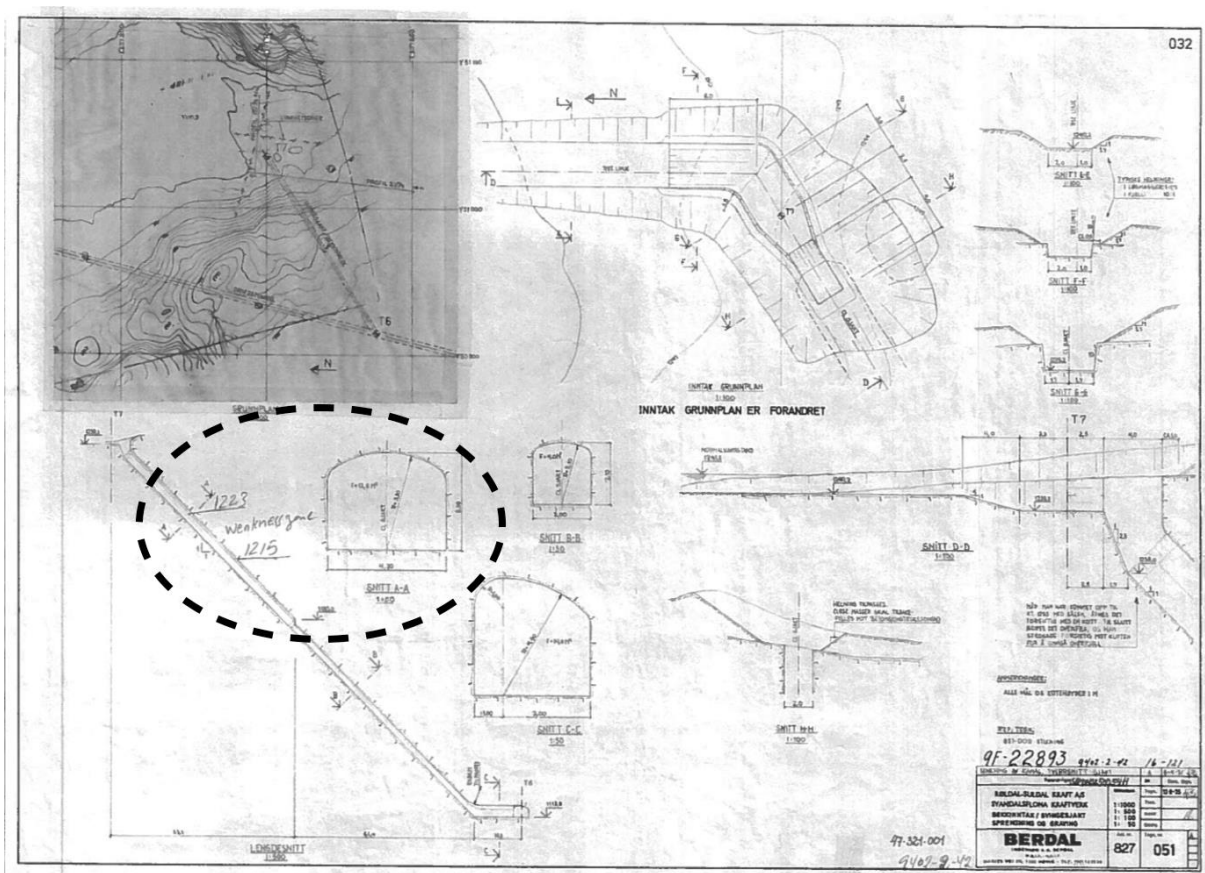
Construction drawing of the Stutakvelven inclined shaft by Berdal AS (1978a).
